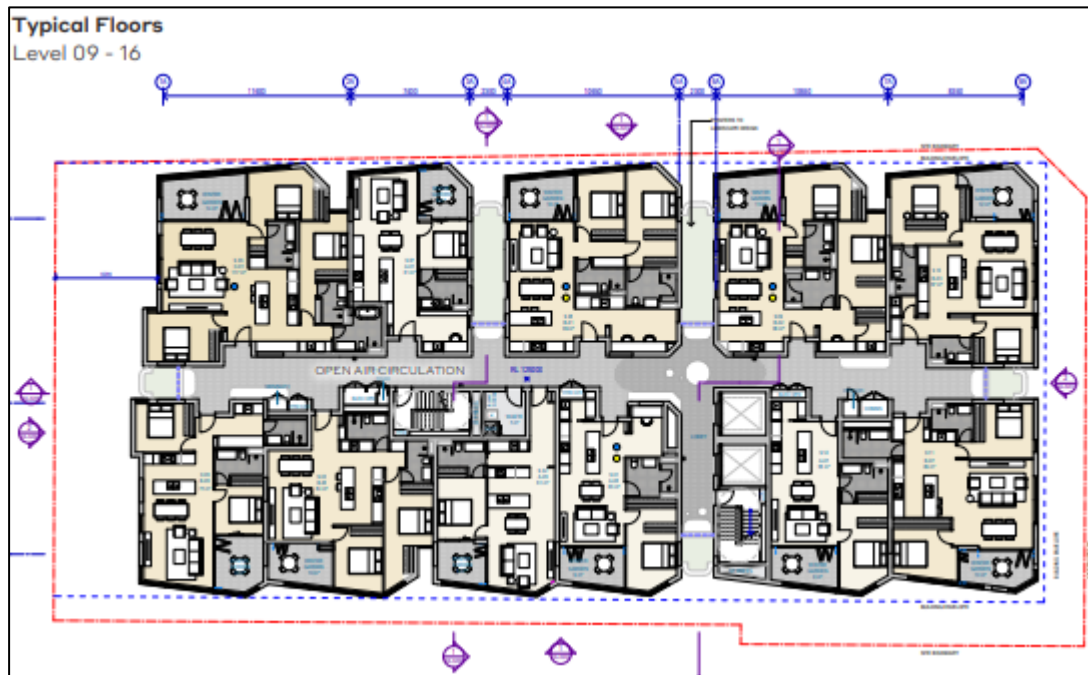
Typical Floor Level 09-16 (Source: Woods Bagot, 2024)
